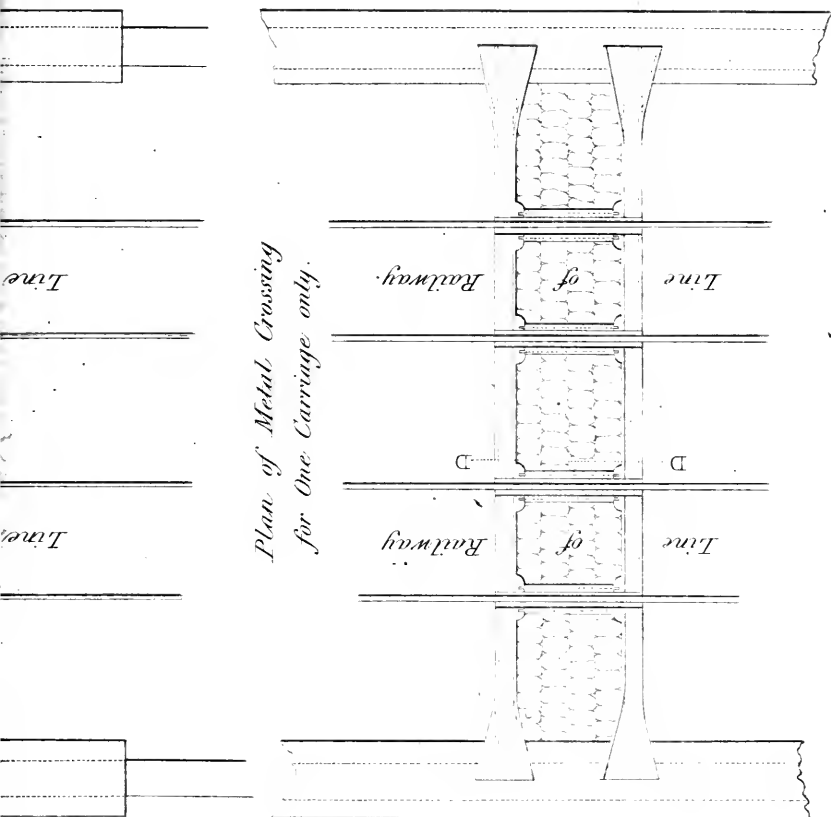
<sup>m</sup> Plan. Section at B.B.
